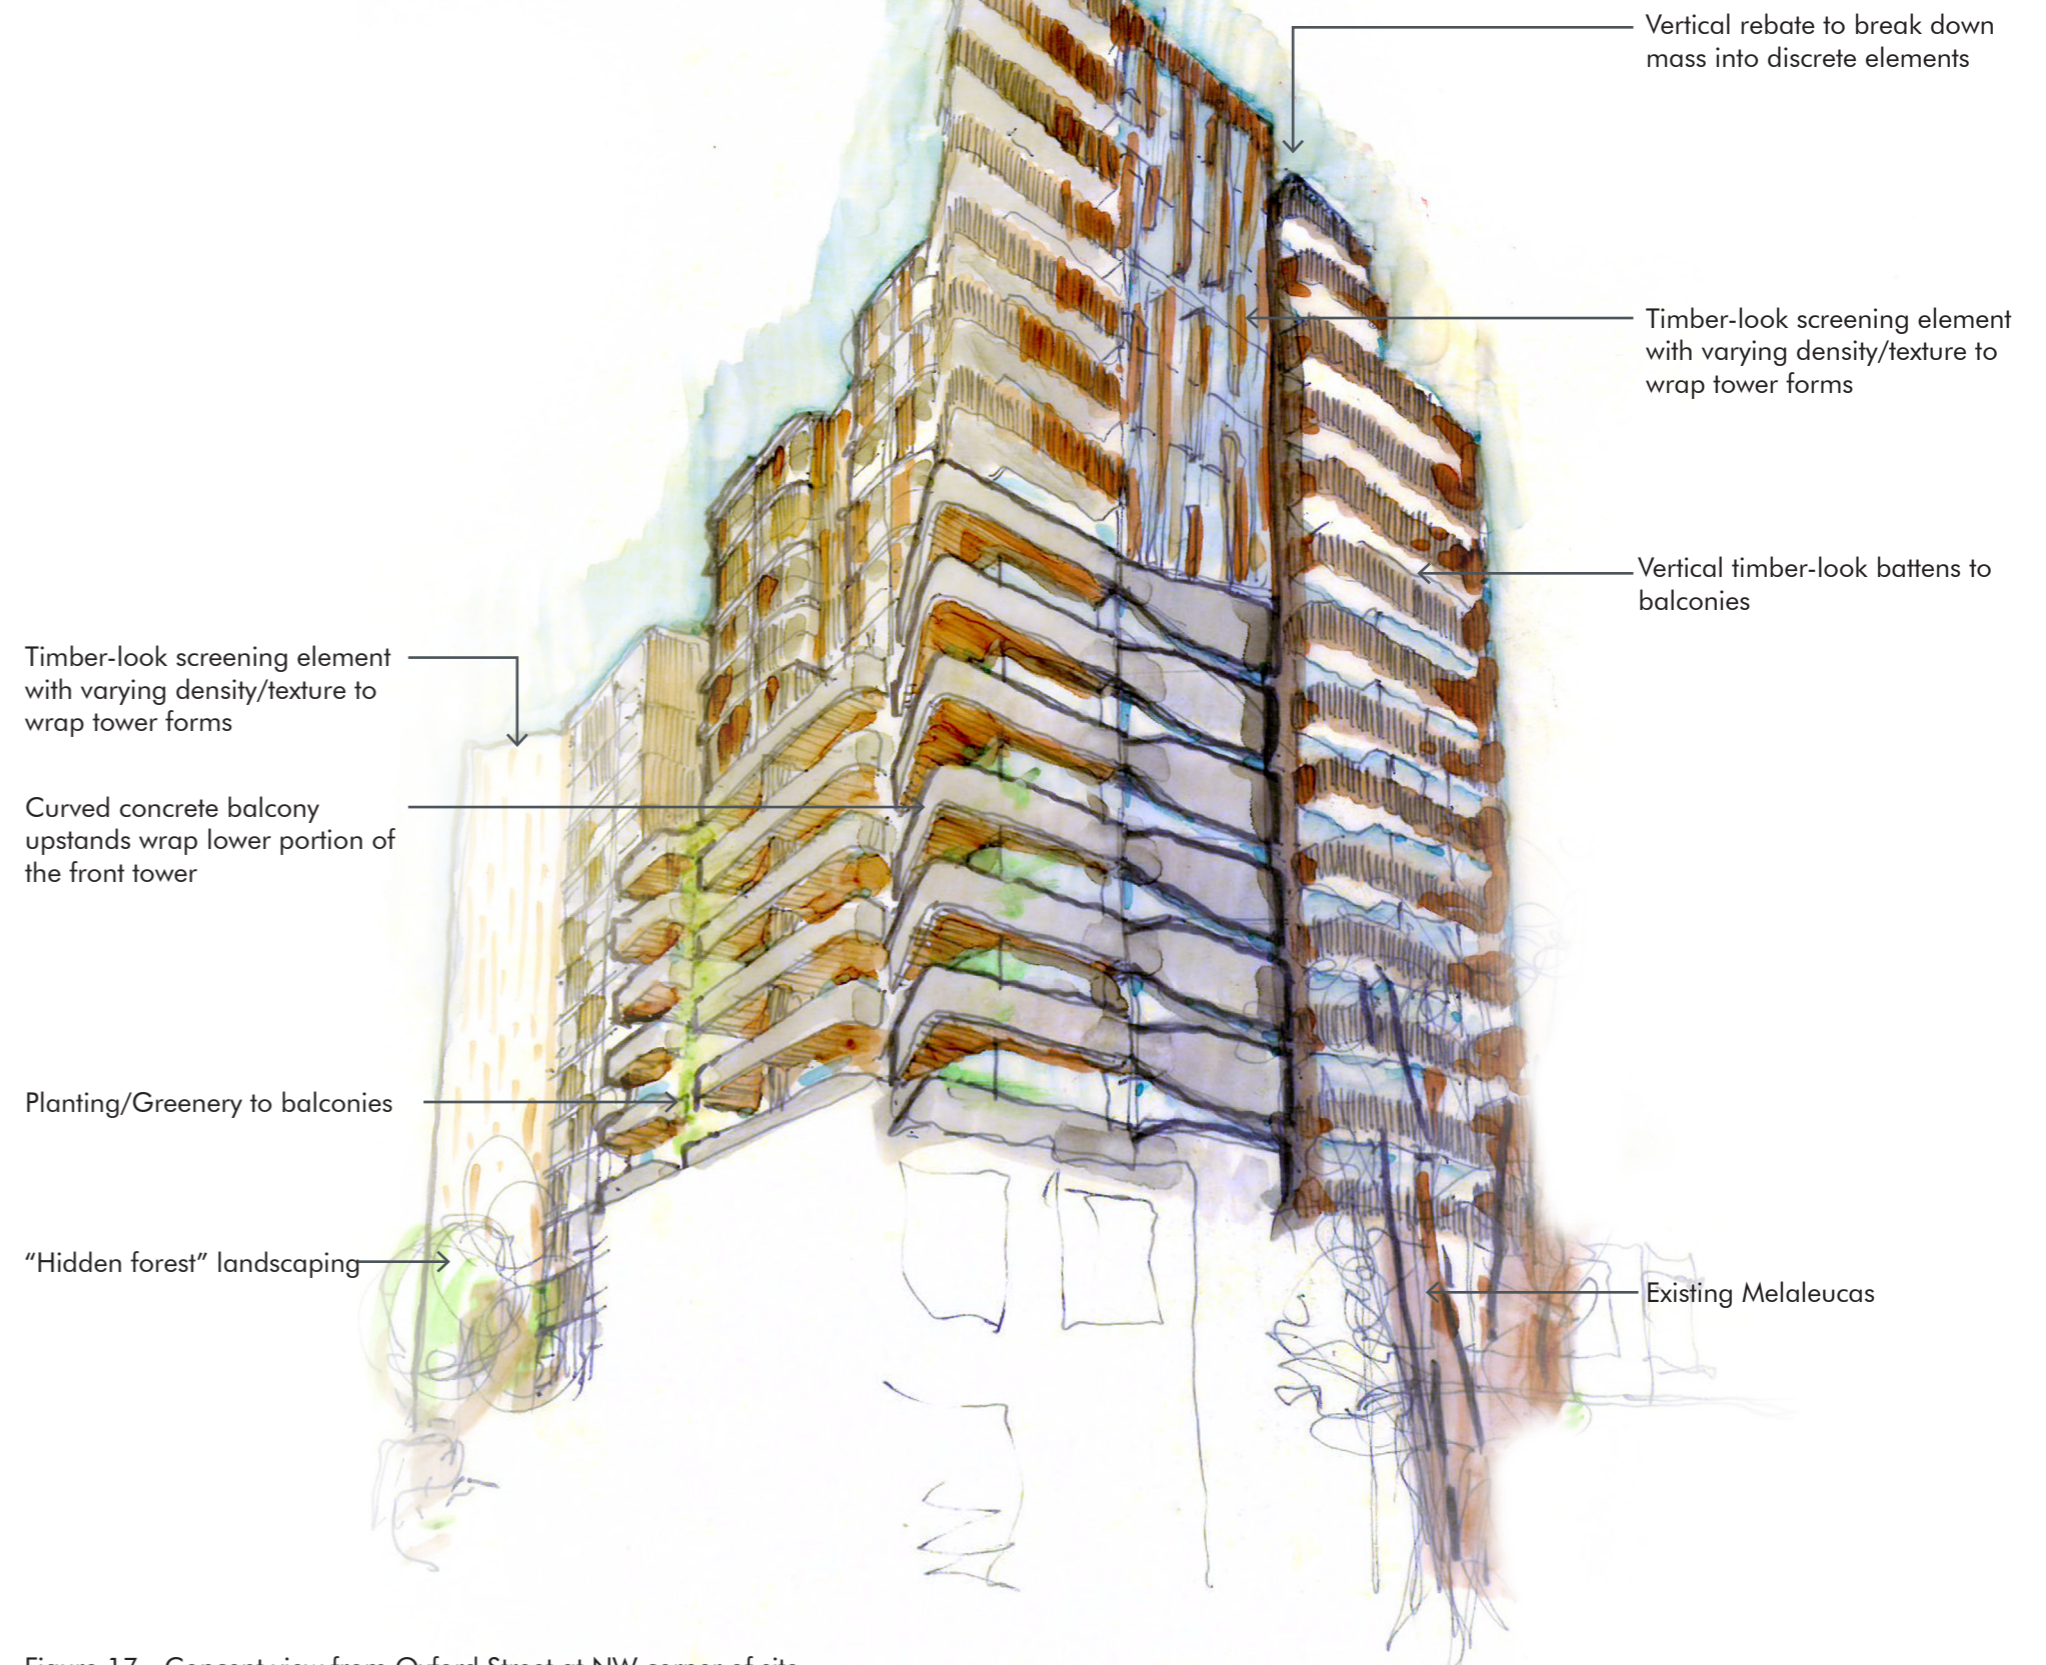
Concept view from Oxford Street at NW corner of site. Vertical Rebates emphasise verticality and materiality reinforces concept
